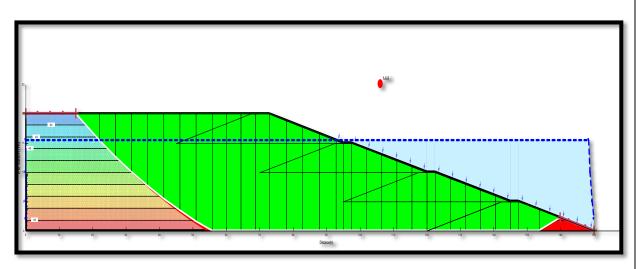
Embankment cross section for 1:4.5 slope at 15 m water level
